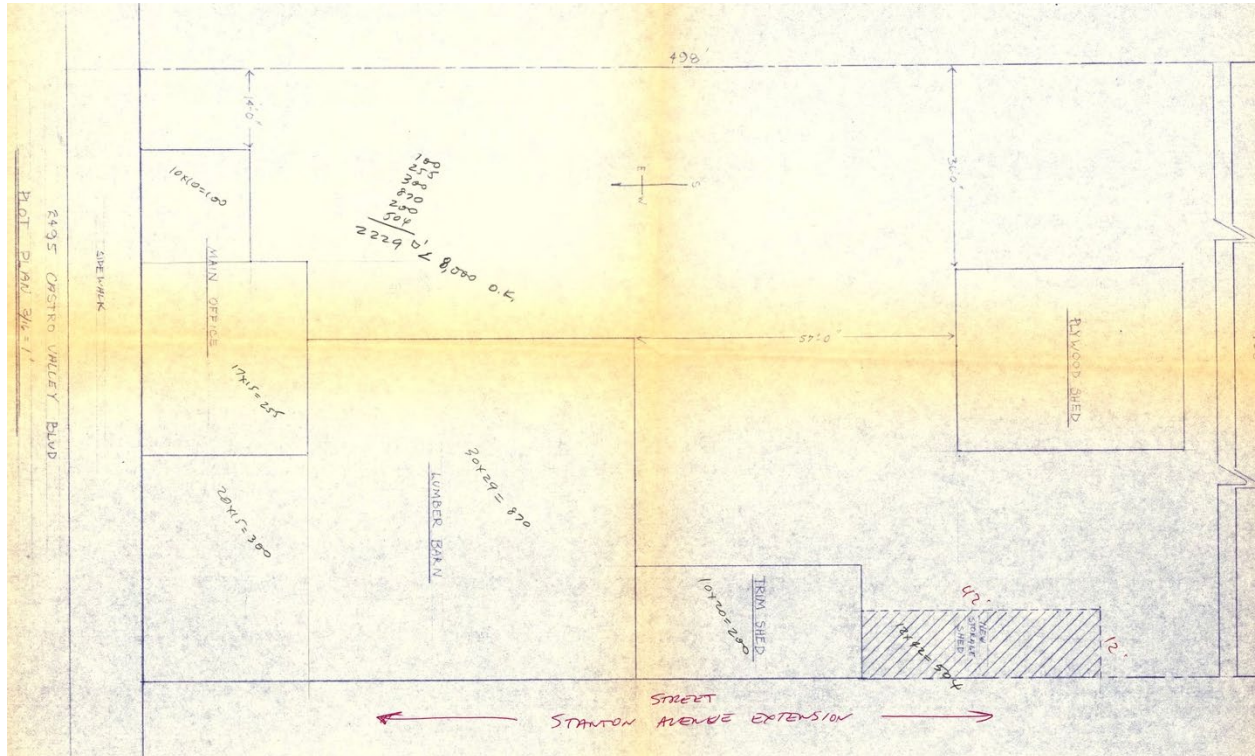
2495 Castro Valley Blvd. – Site plan, 1988 (from Alameda County Public Works, north at upper left)
